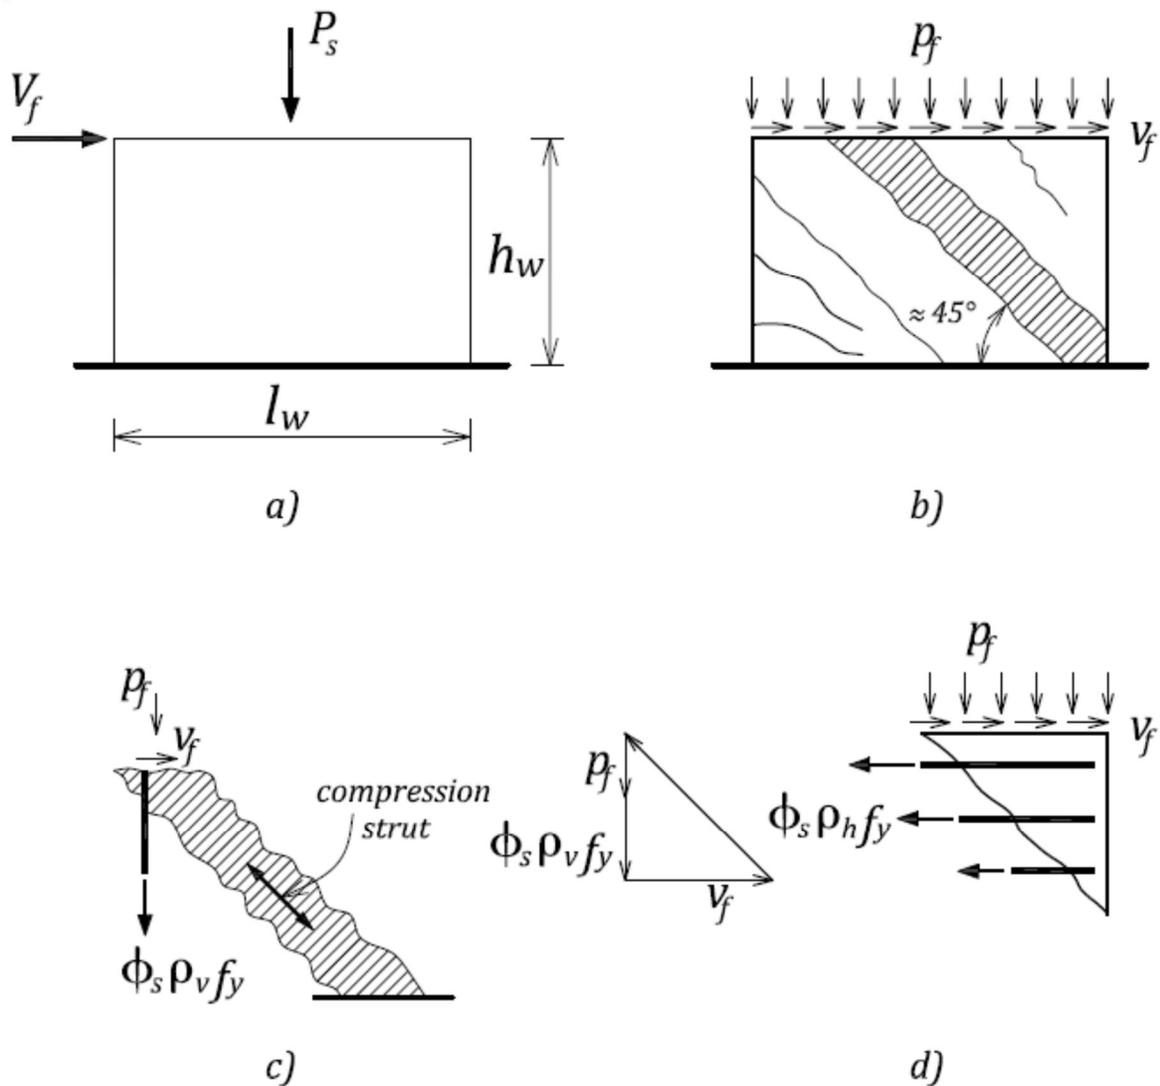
Shear failure mechanism for a squat shear wall: a) wall subjected to shear and axial load; b) crack pattern; c) compression strut; d) free-body diagram.
